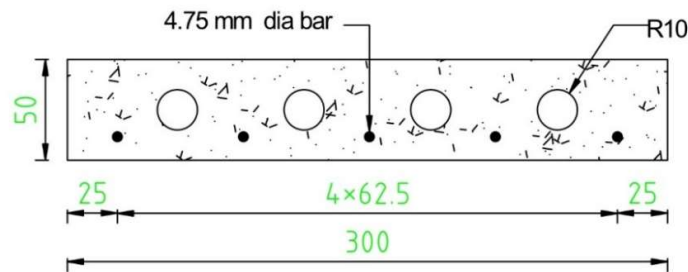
50 mm thick precast panel (all dimensions are in mm)
